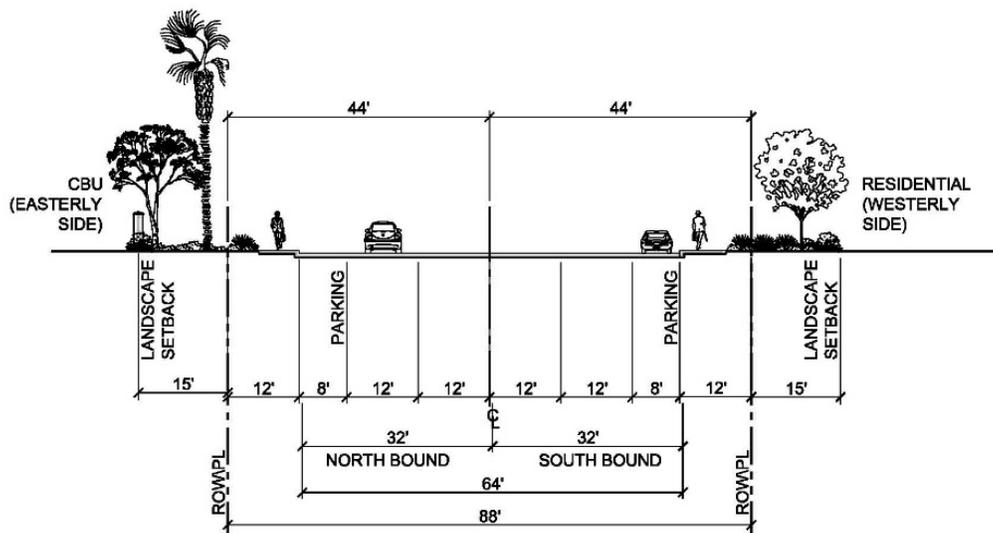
EXISTING (2018) MONROE STREET CROSSWALK
